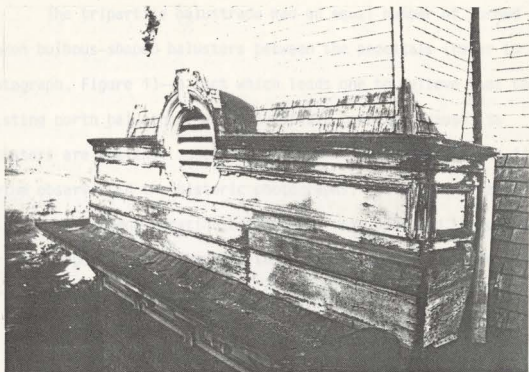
Northwest Corner Tower Above Cornice: 1988 View
